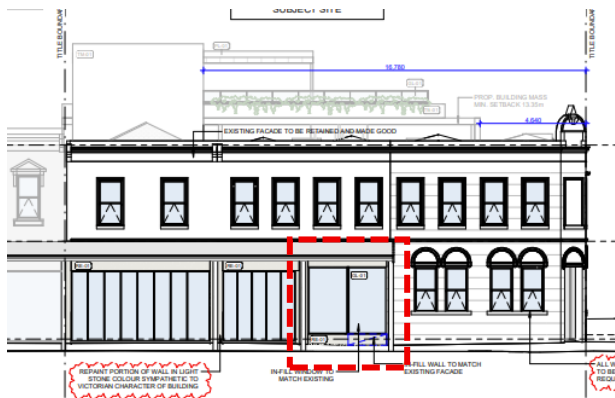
New infill window and lower section of infill wall to replace the current in-go on the Clarendon Street façade. Source: Embrace Architects, 2026.
